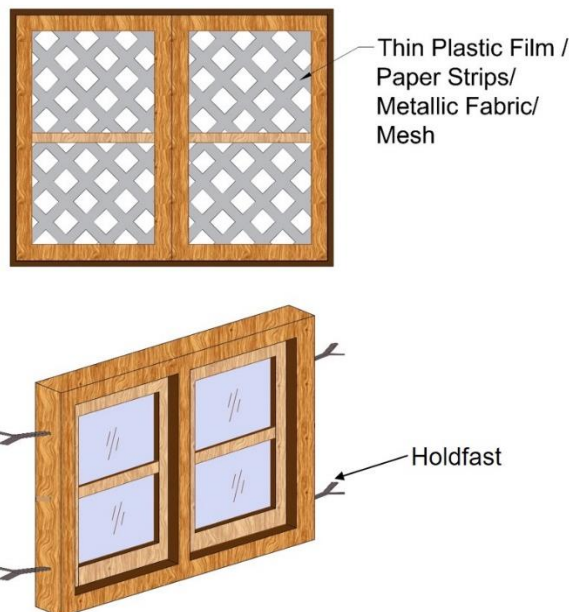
(A) PROTECTION OF GLASS PANNELLING AND ADEQUATE ANCHORAGE OF WOODEN DOOR AND WINDOW FRAMES WITH HOLDFASTS
